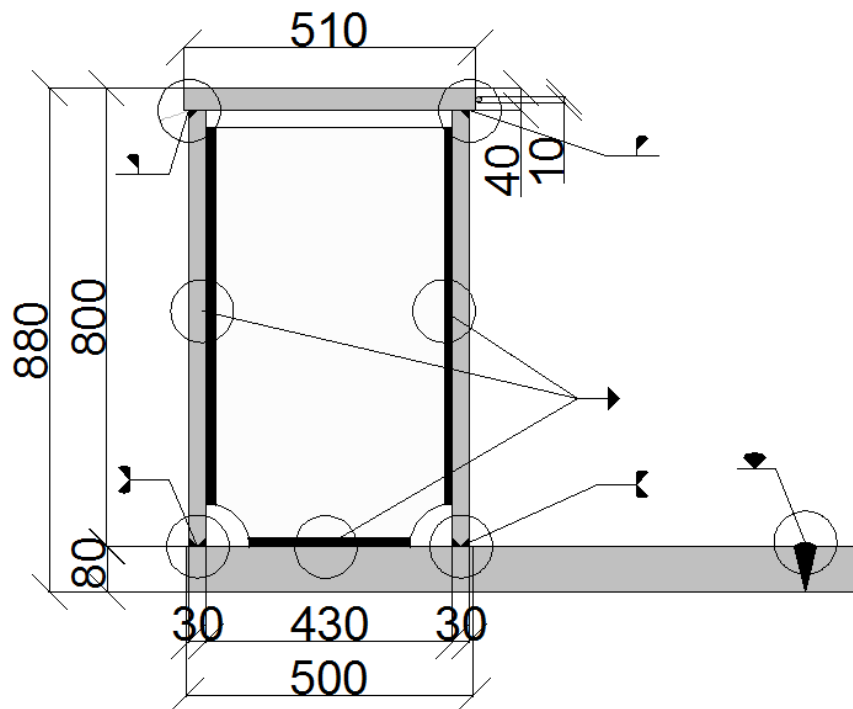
Details of the weldings involved in the assembling of the box girder
